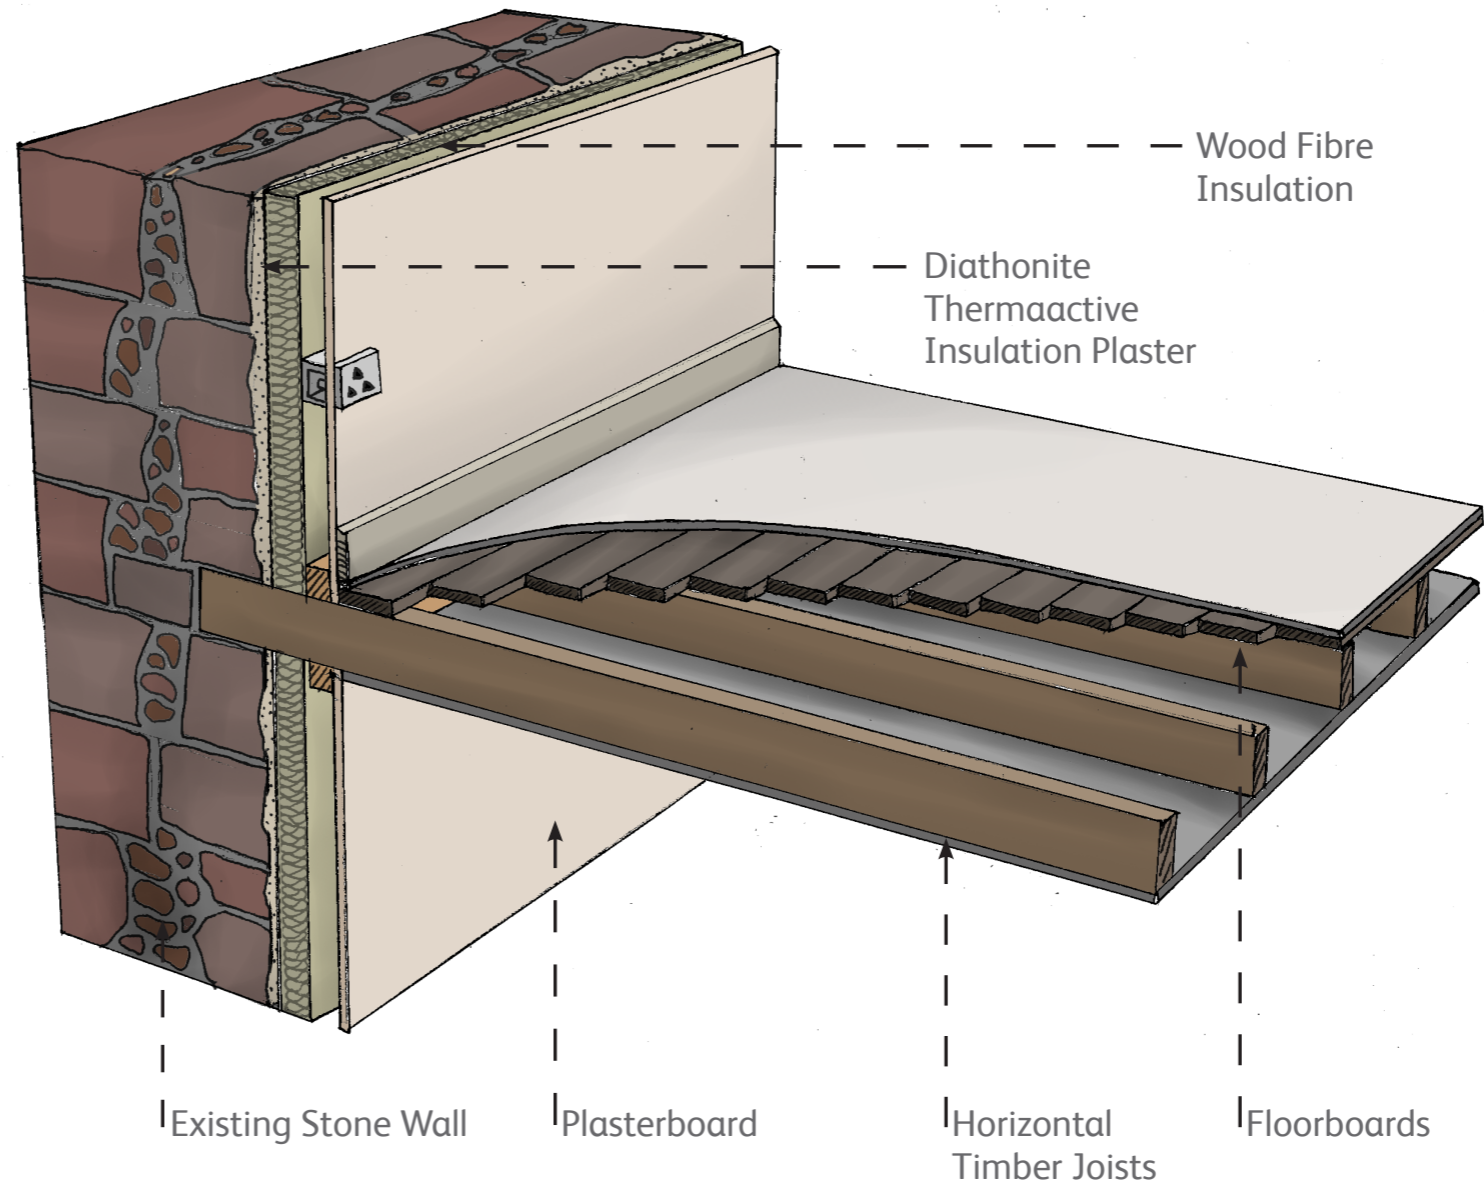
Detail of existing floor joists embedded in stone wall with new internal wall insulation to wall above and below floor
